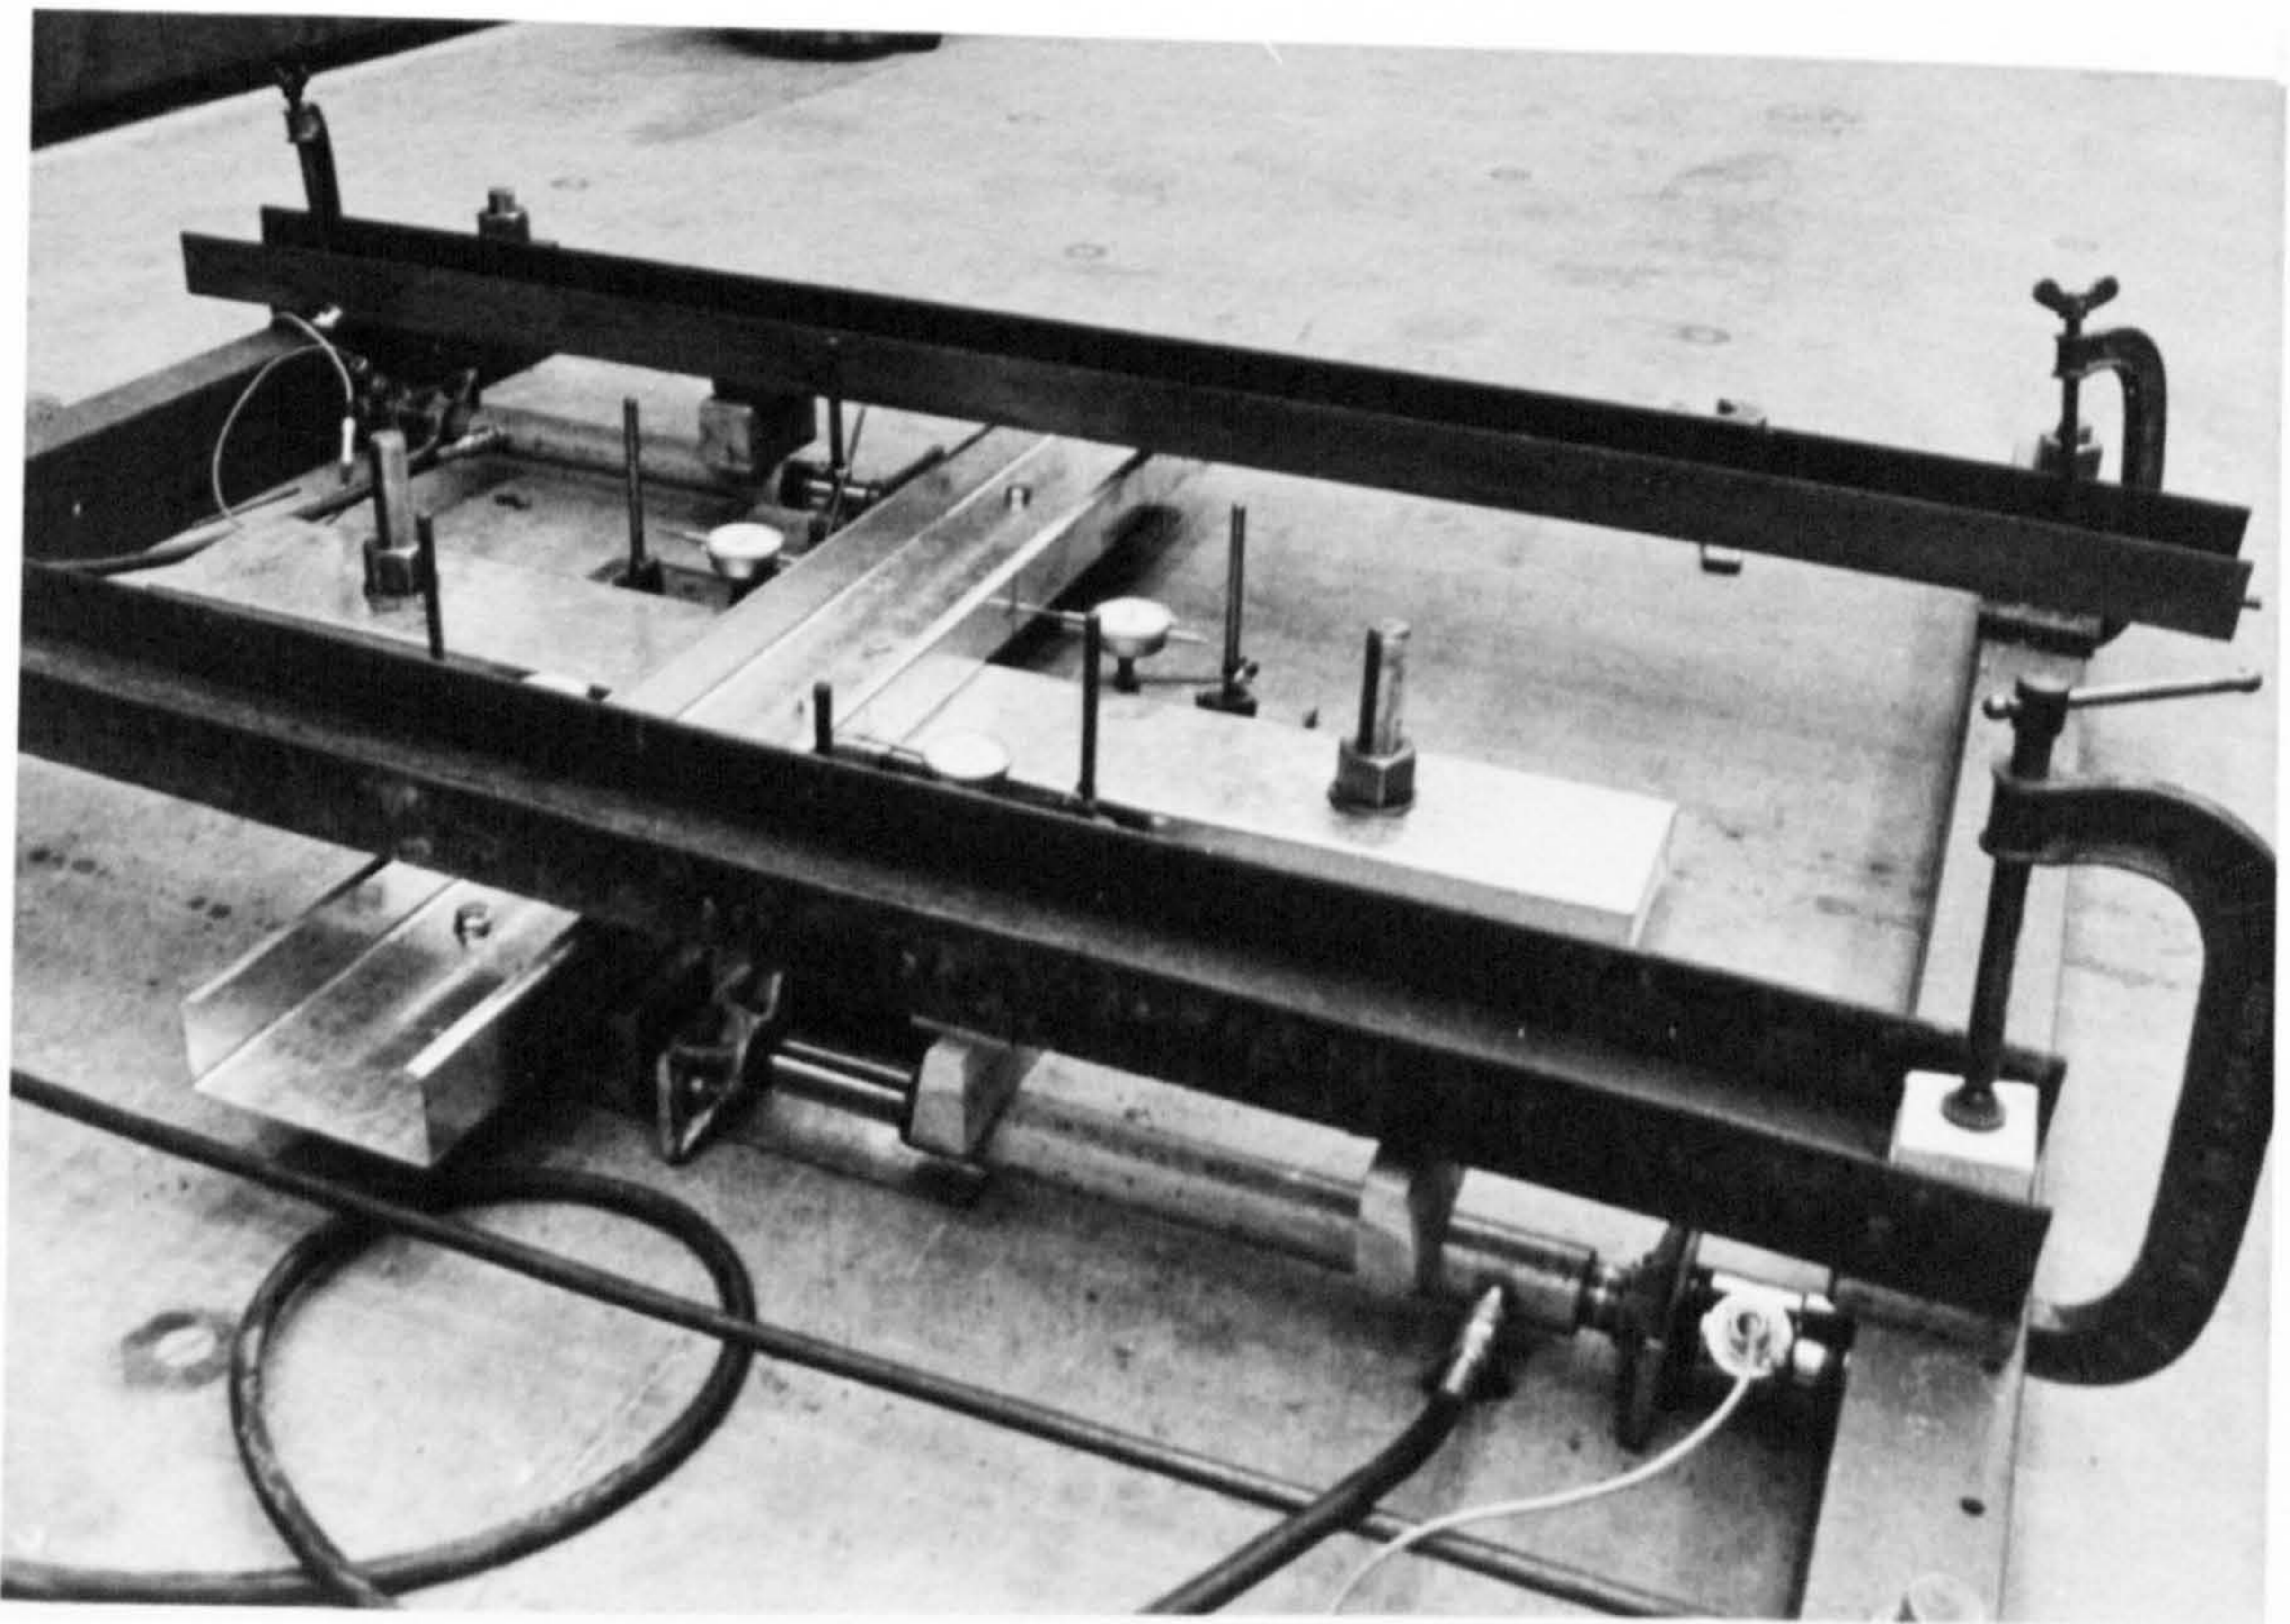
Restraints positioned above the loading jacks to prevent them from buckling out of plane
